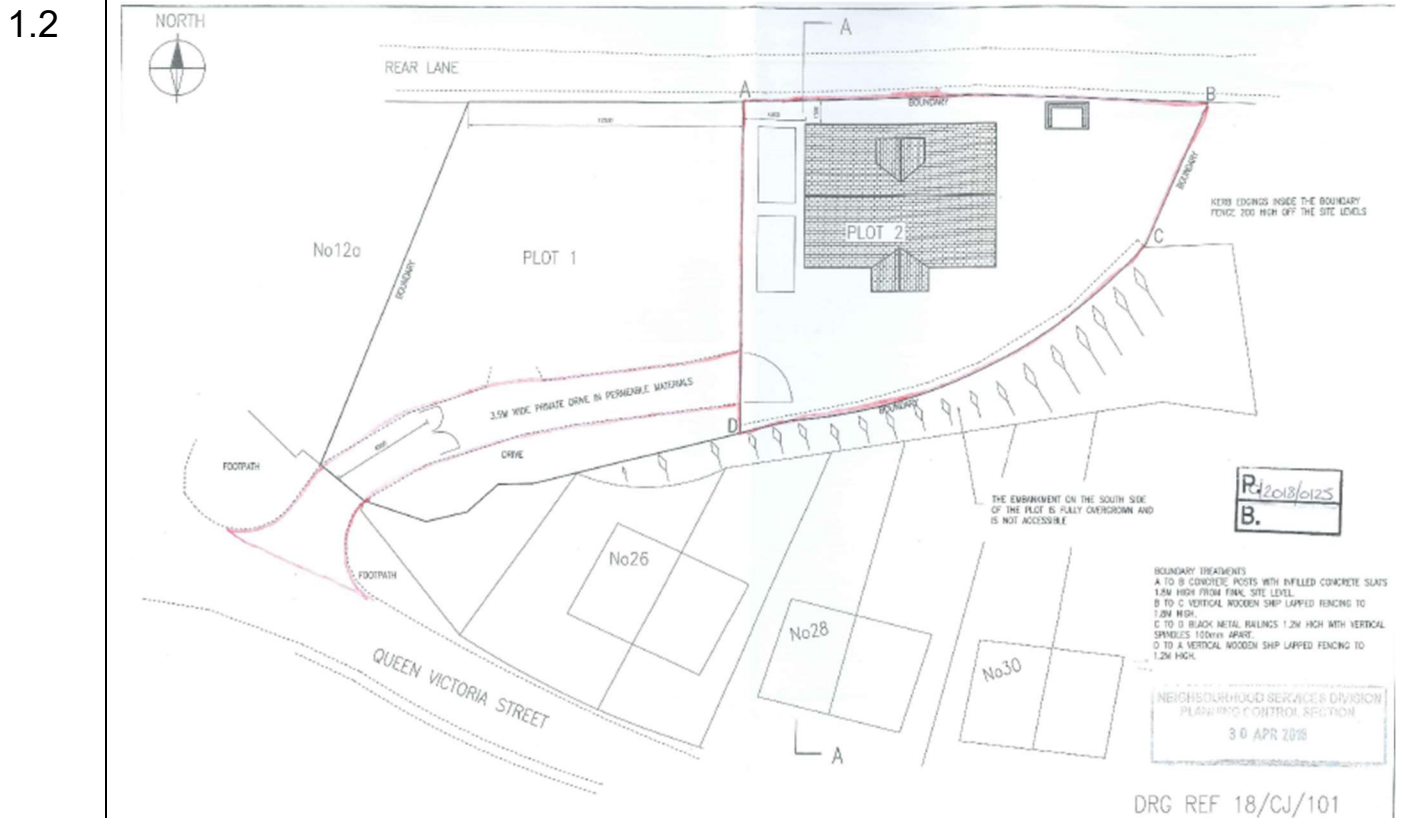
Site Layout approved on 2018 application showing access via plot 1.
